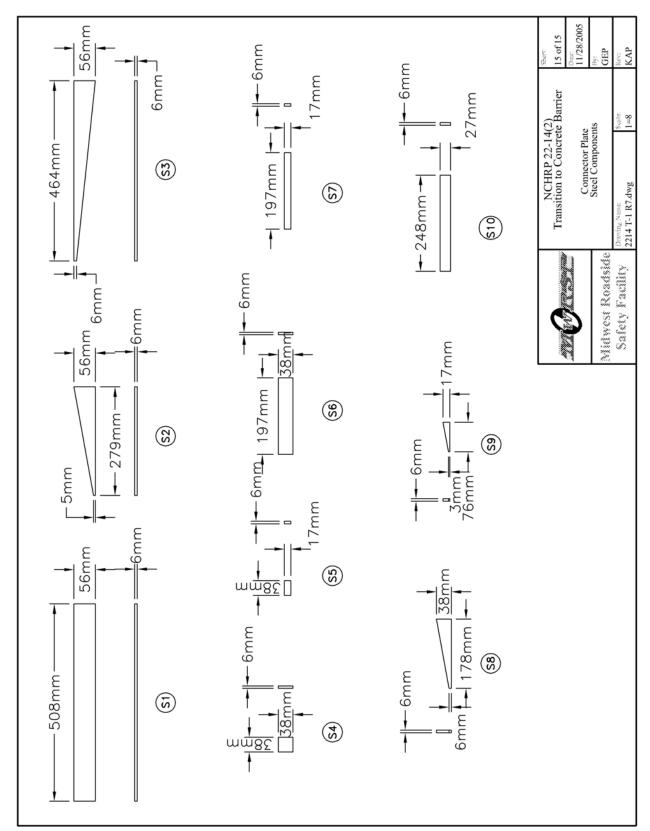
Approach Guardrail Transition to Concrete Barrier Design - Connector Plate Details
